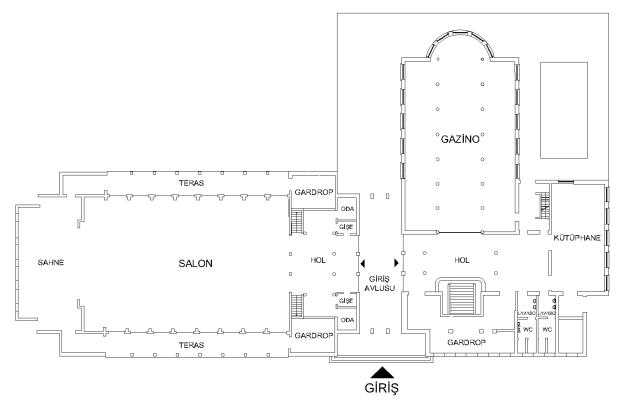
Izmit People's House ground floor plan (It was redrawn by making use of the ground floor plan of Izmit People's House, included in the work of Cengizkan (2012, 133)).
